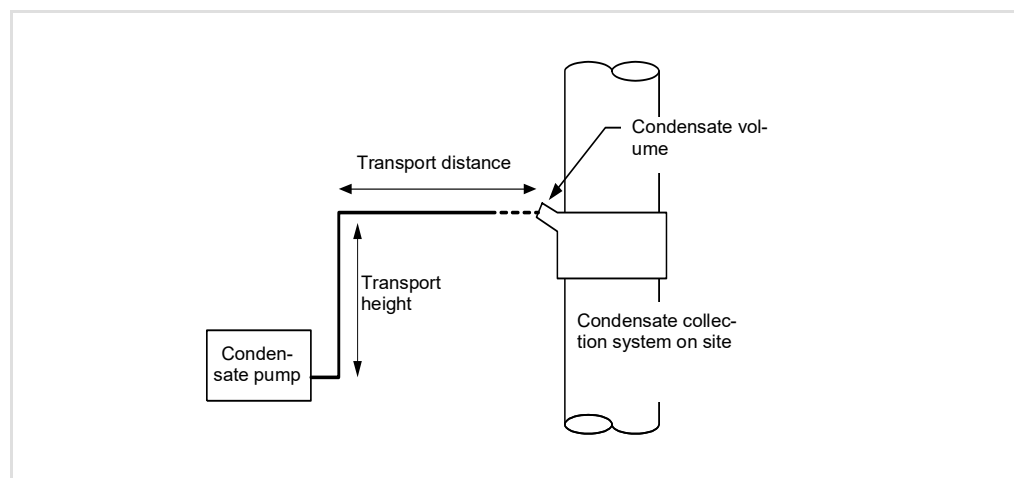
Diagram of connecting the condensate pump to the condensate drain collection system
